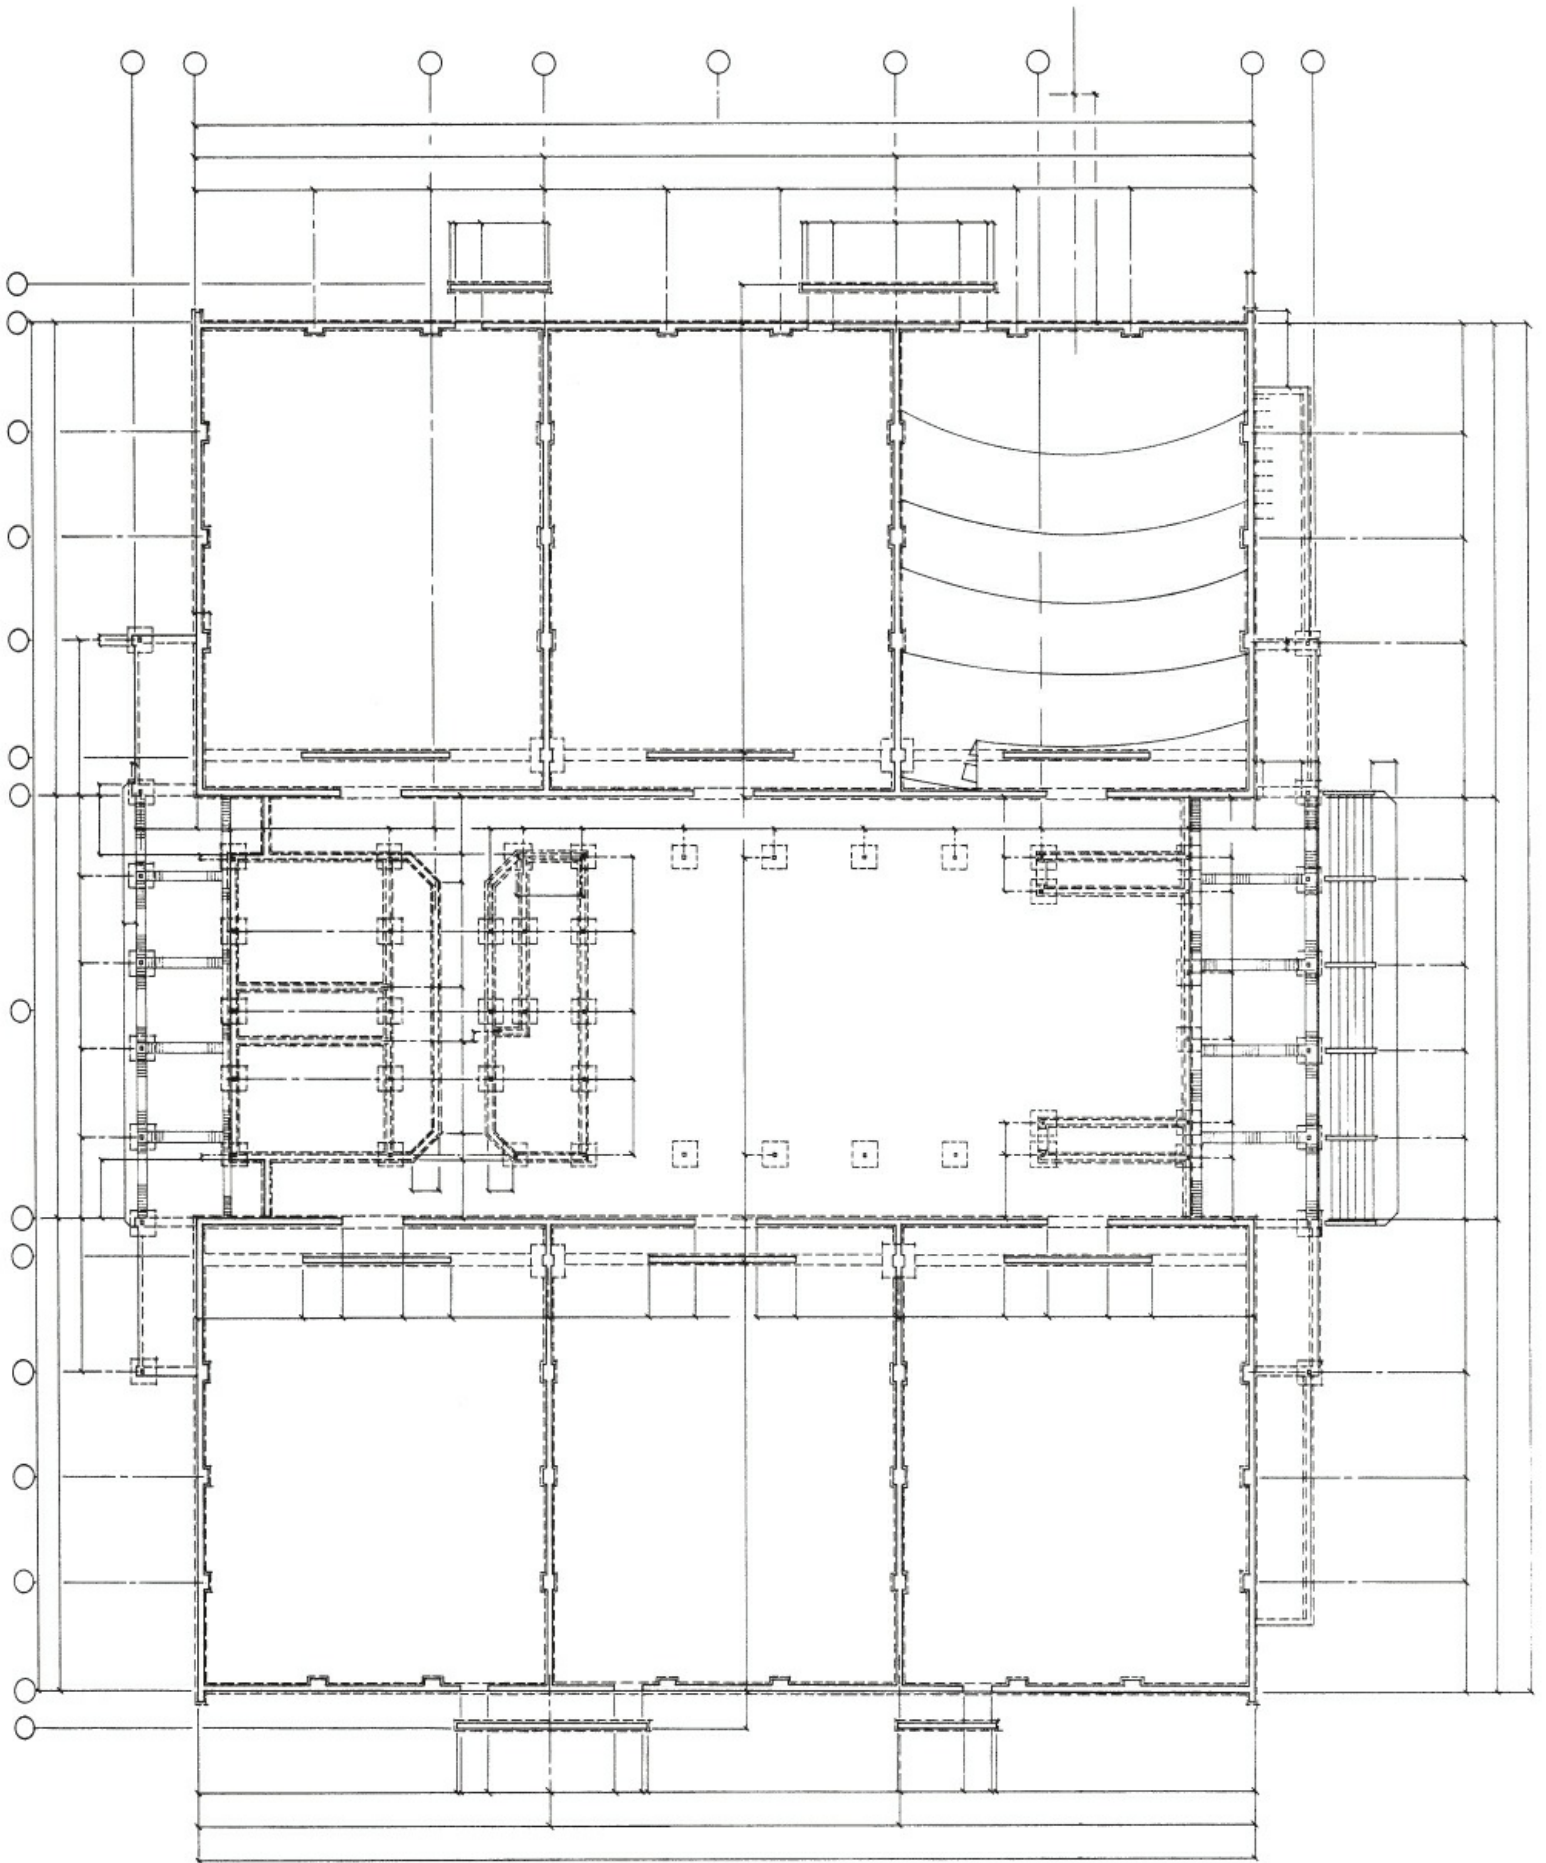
Theater—Stage I: Working drawing—foundation plan.
